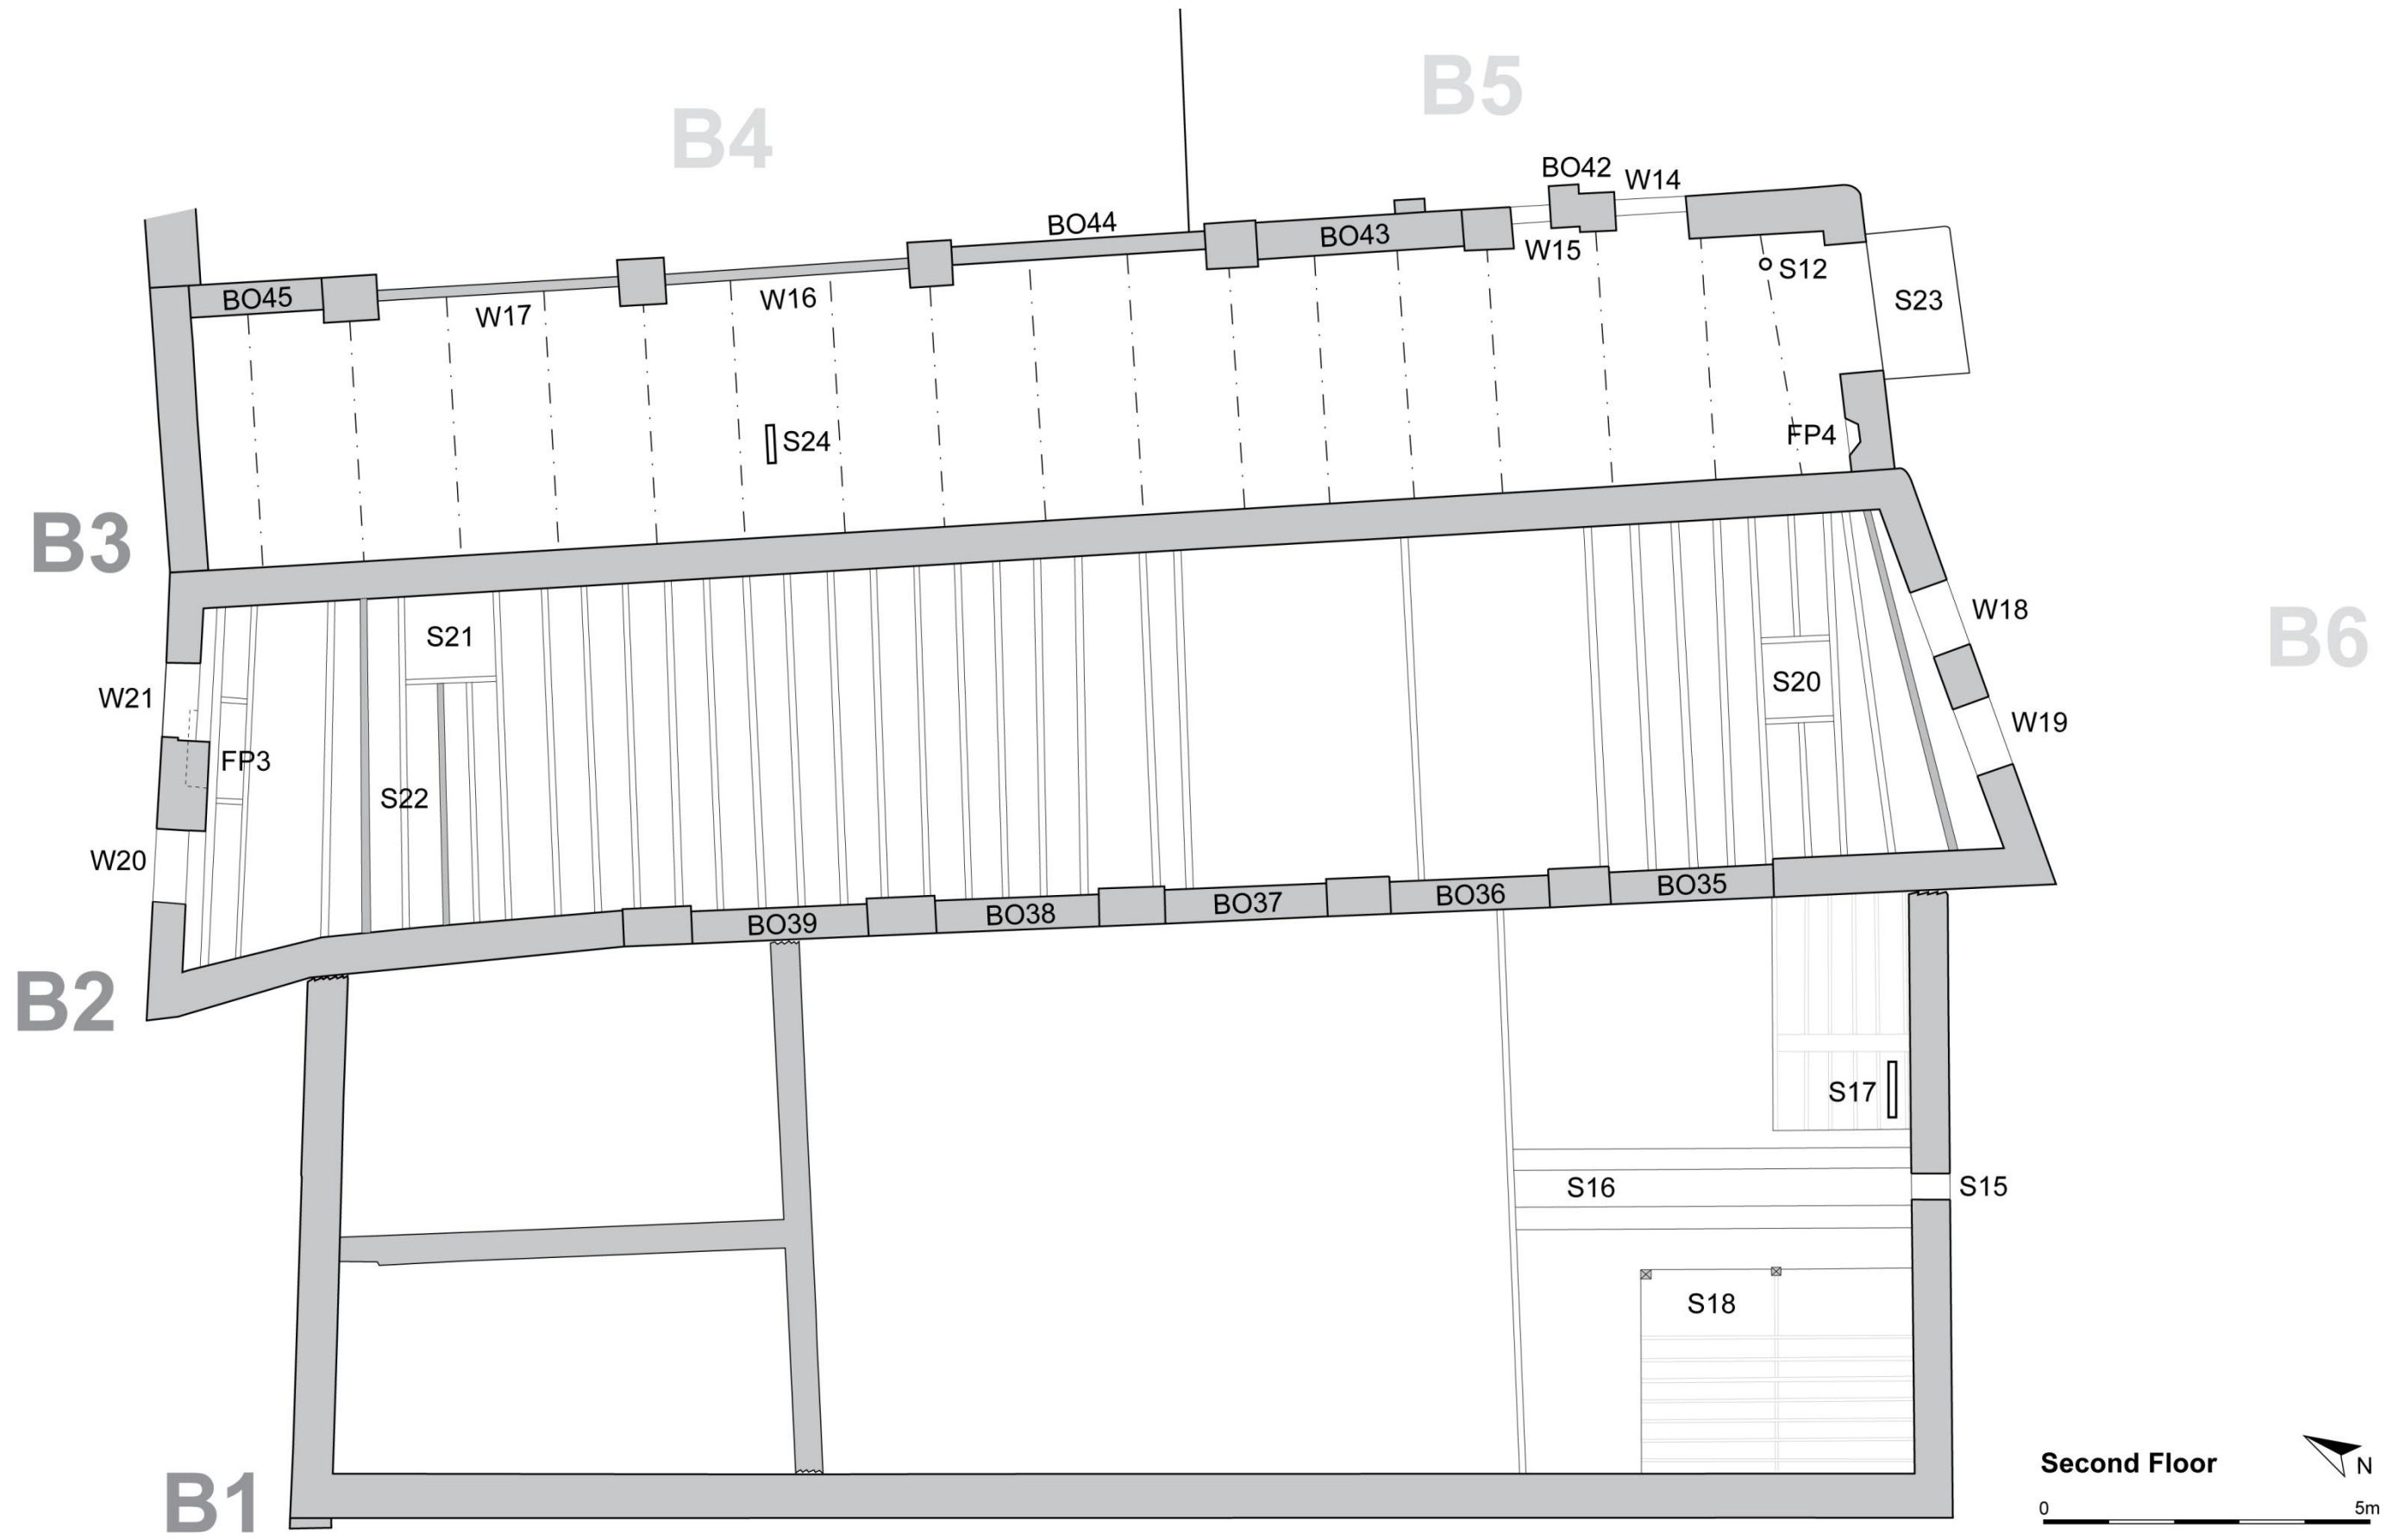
SECOND-FLOOR PLAN OF B1-B3 SHOWING DOORS (Dx), WINDOWS (Wx), FIRE PLACES (FPx), BLOCKED OPENINGS (BOx) AND SIGNIFICANT FEATURES (Sx).
